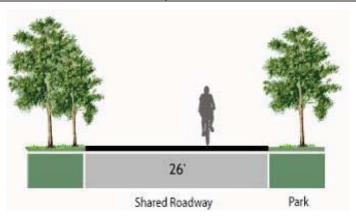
Section 1.6.1 Bicycle Boulevard on Willamette Park Road south of parking lot
